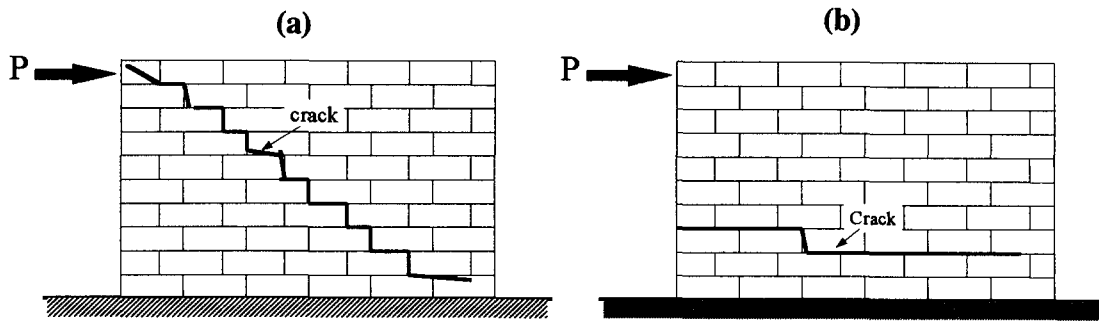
Modes of Failure In URM Wall Subjected to Lateral Load P: (a) Diagonal Tension Cracking; (b) Slip along Bed Joint
